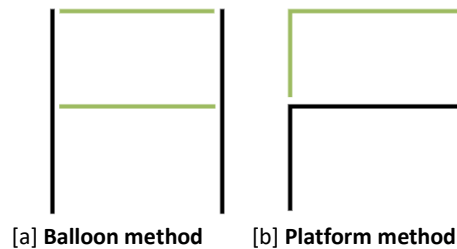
Structural systems for timber rooftop extension (Aparicio-Gonzalez et al., 2020).
